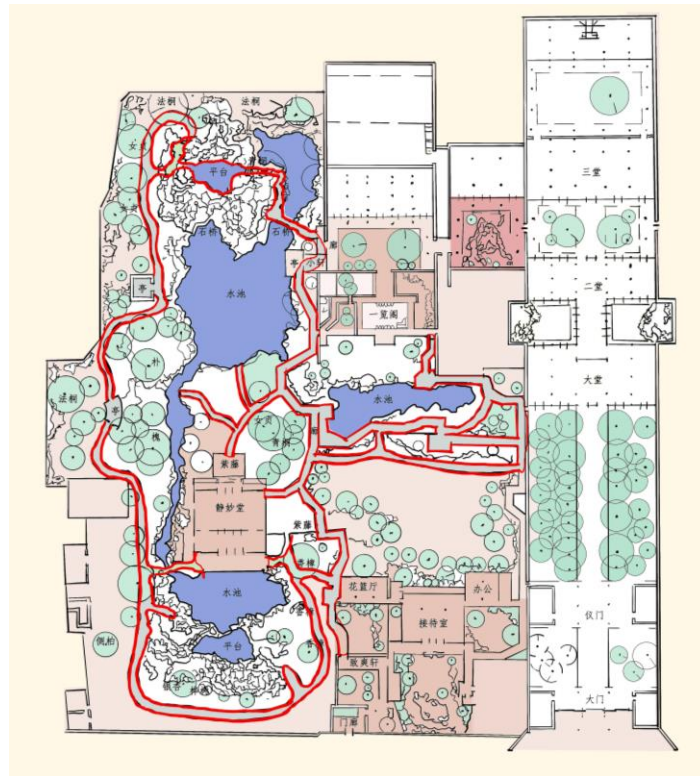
General building plan of Zhanyuan Garden (Self drawn).
